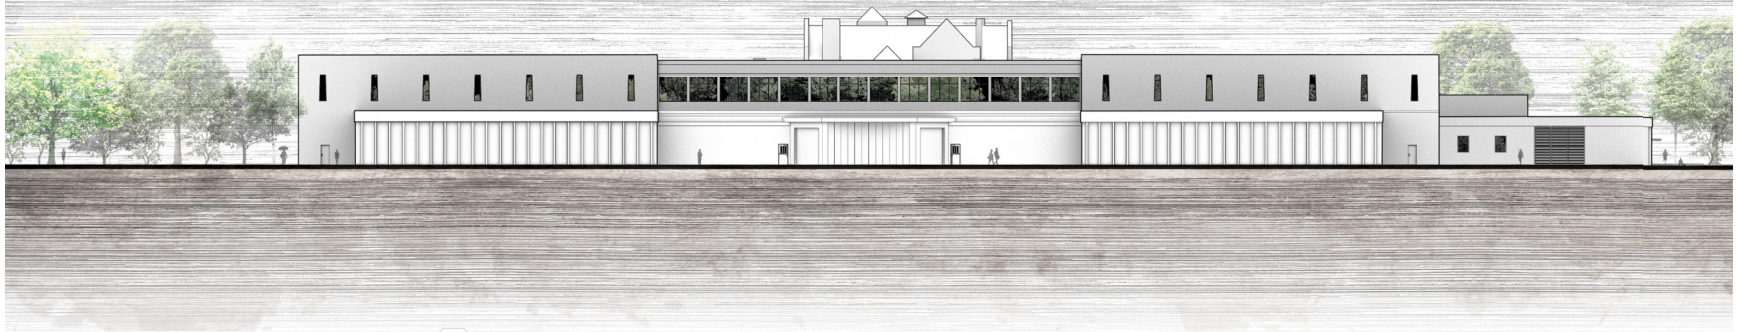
1:700 Existing North Elevations of the Royal Alberta Museum
